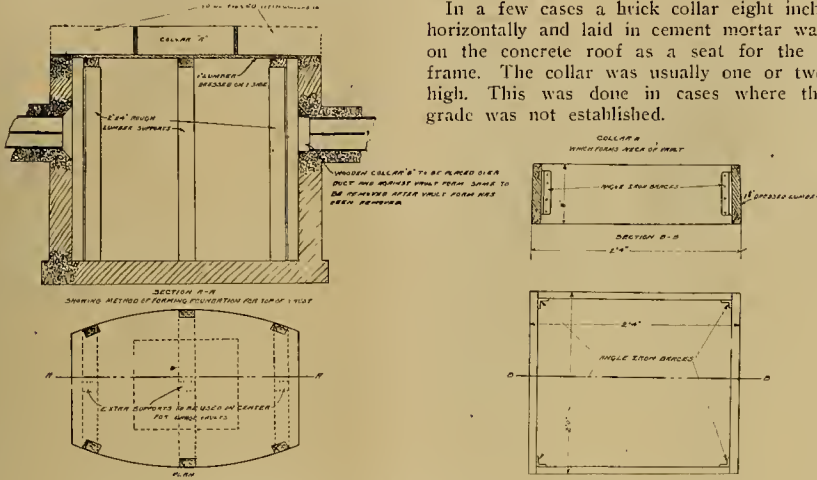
FORMS USED IN CONSTRUCTING A MANHOLE ROOF
